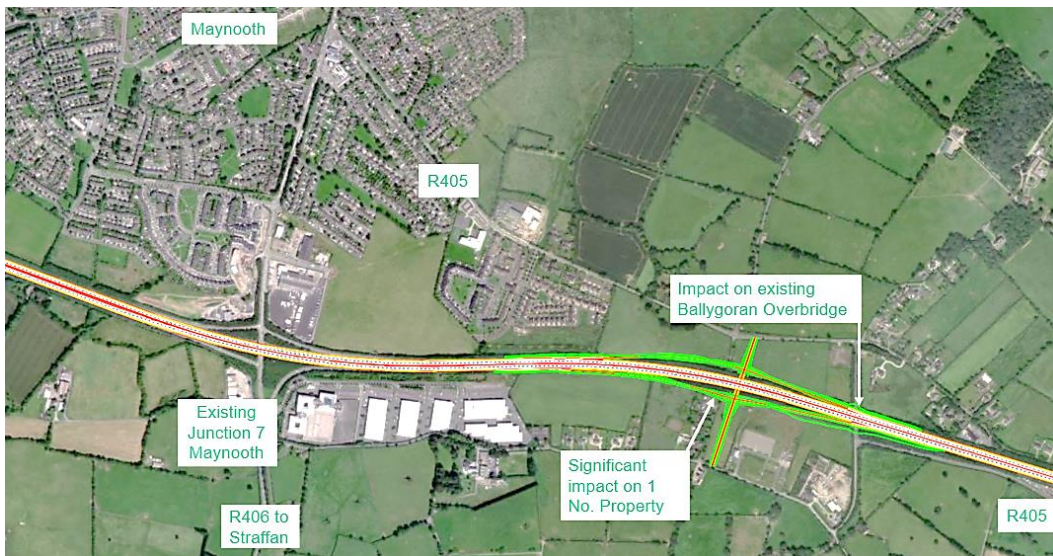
Location D - Junction West of Existing Ballygoran Overbridge
